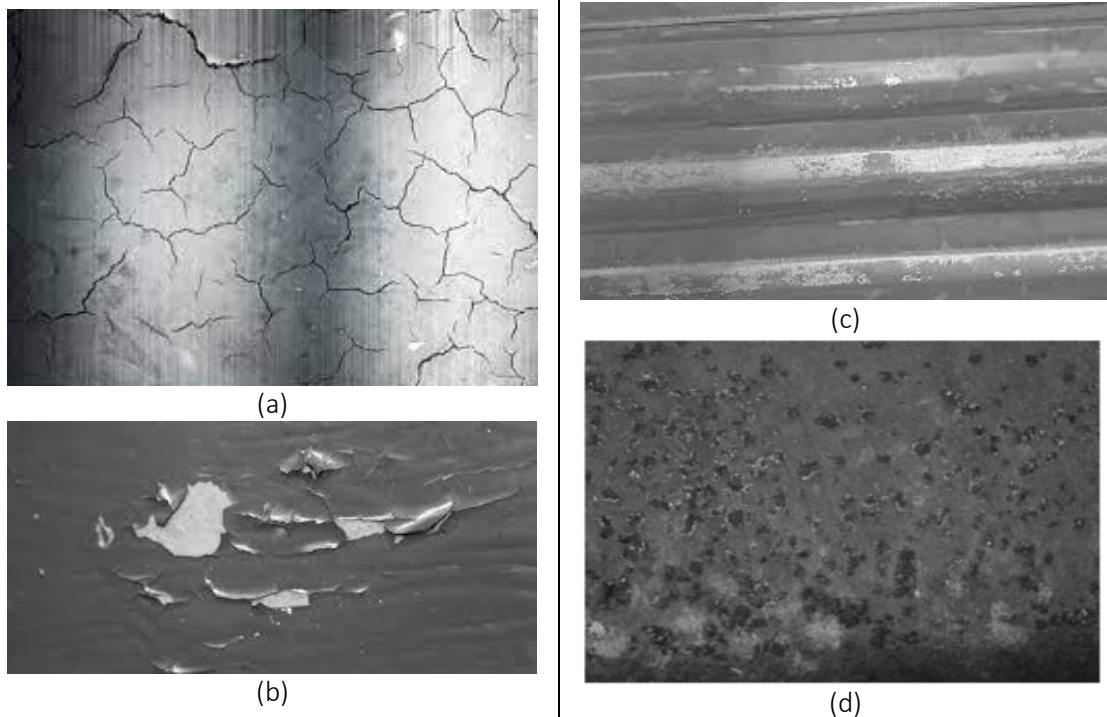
A) Cracking of the steel protection coating. B) Flaking. C) Chalking. D) Pitting.
